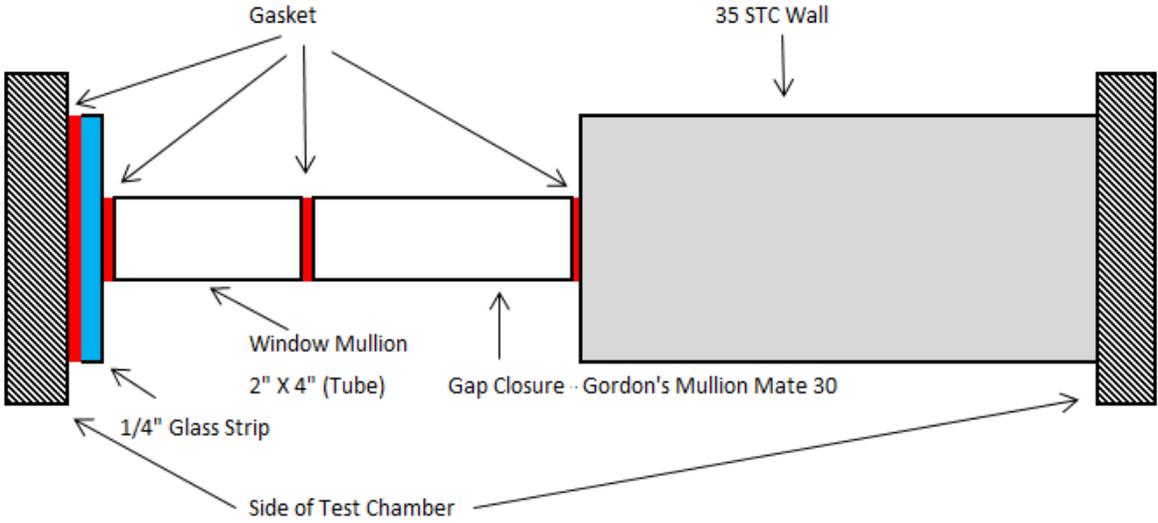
Section View of 35 STC Wall with Glass, Window Mullion, and Mullion Mate 30
